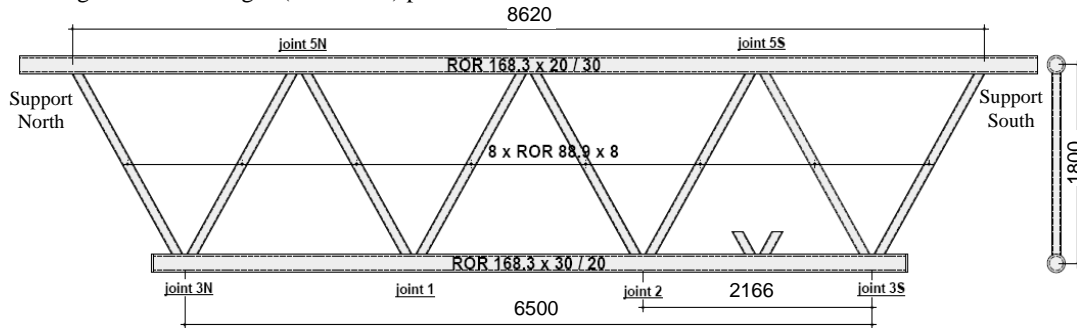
Tubular truss beam dimensions of specimens S6 and S7.
